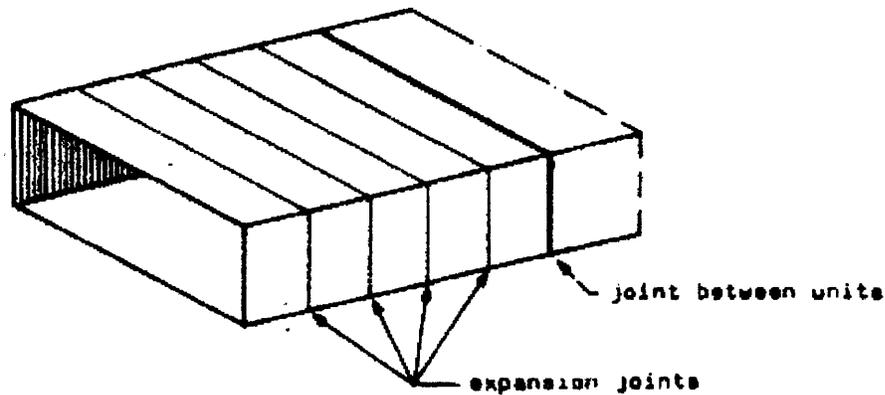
, Scheme of Immersed Tunnel, (Janssen 1978)
